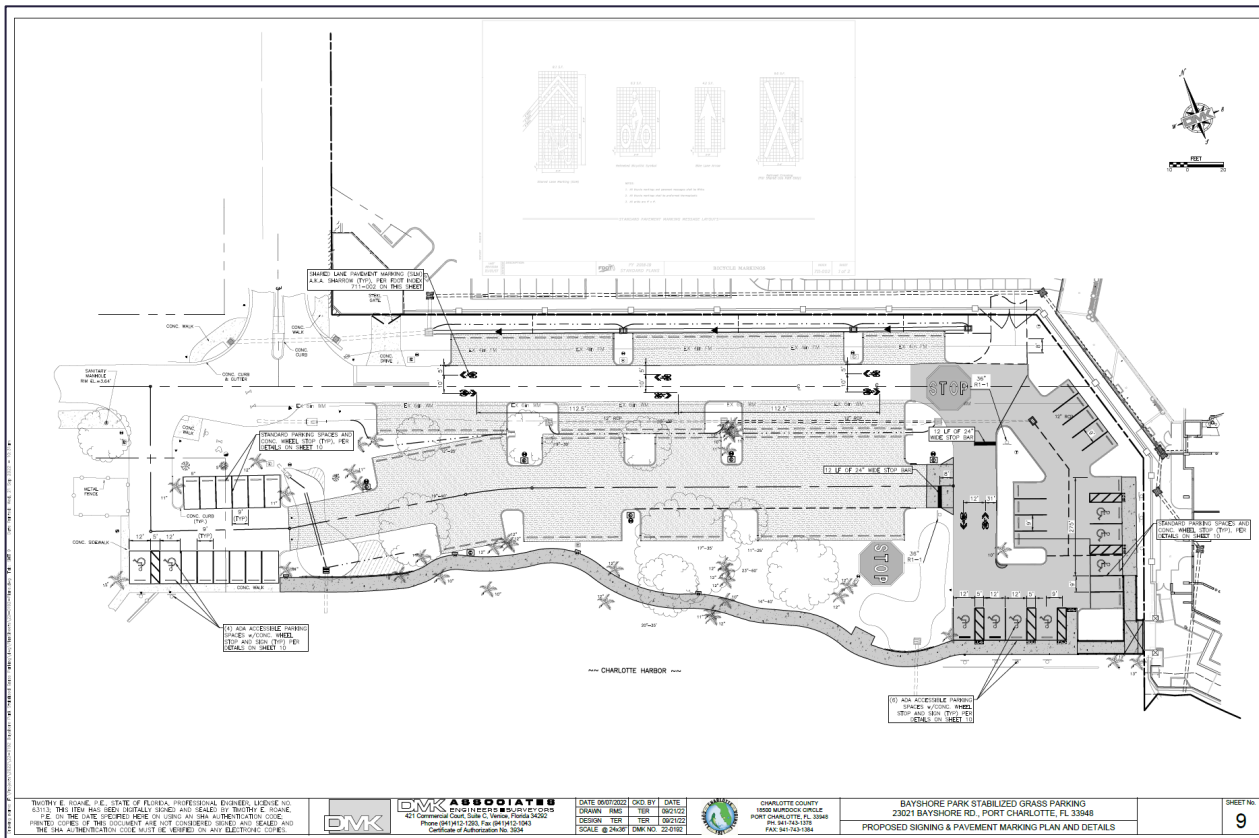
Bayshore Parking Improvements Plan (Draft)
